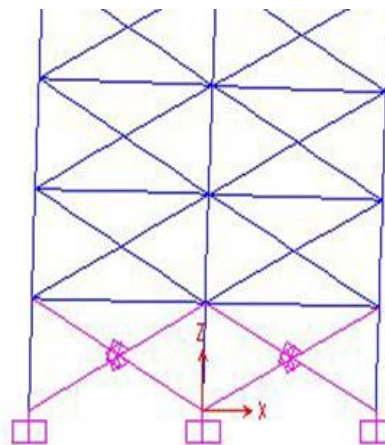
Deformed Shape of Frame-2 after Analysis with Damper due to EQ Load
